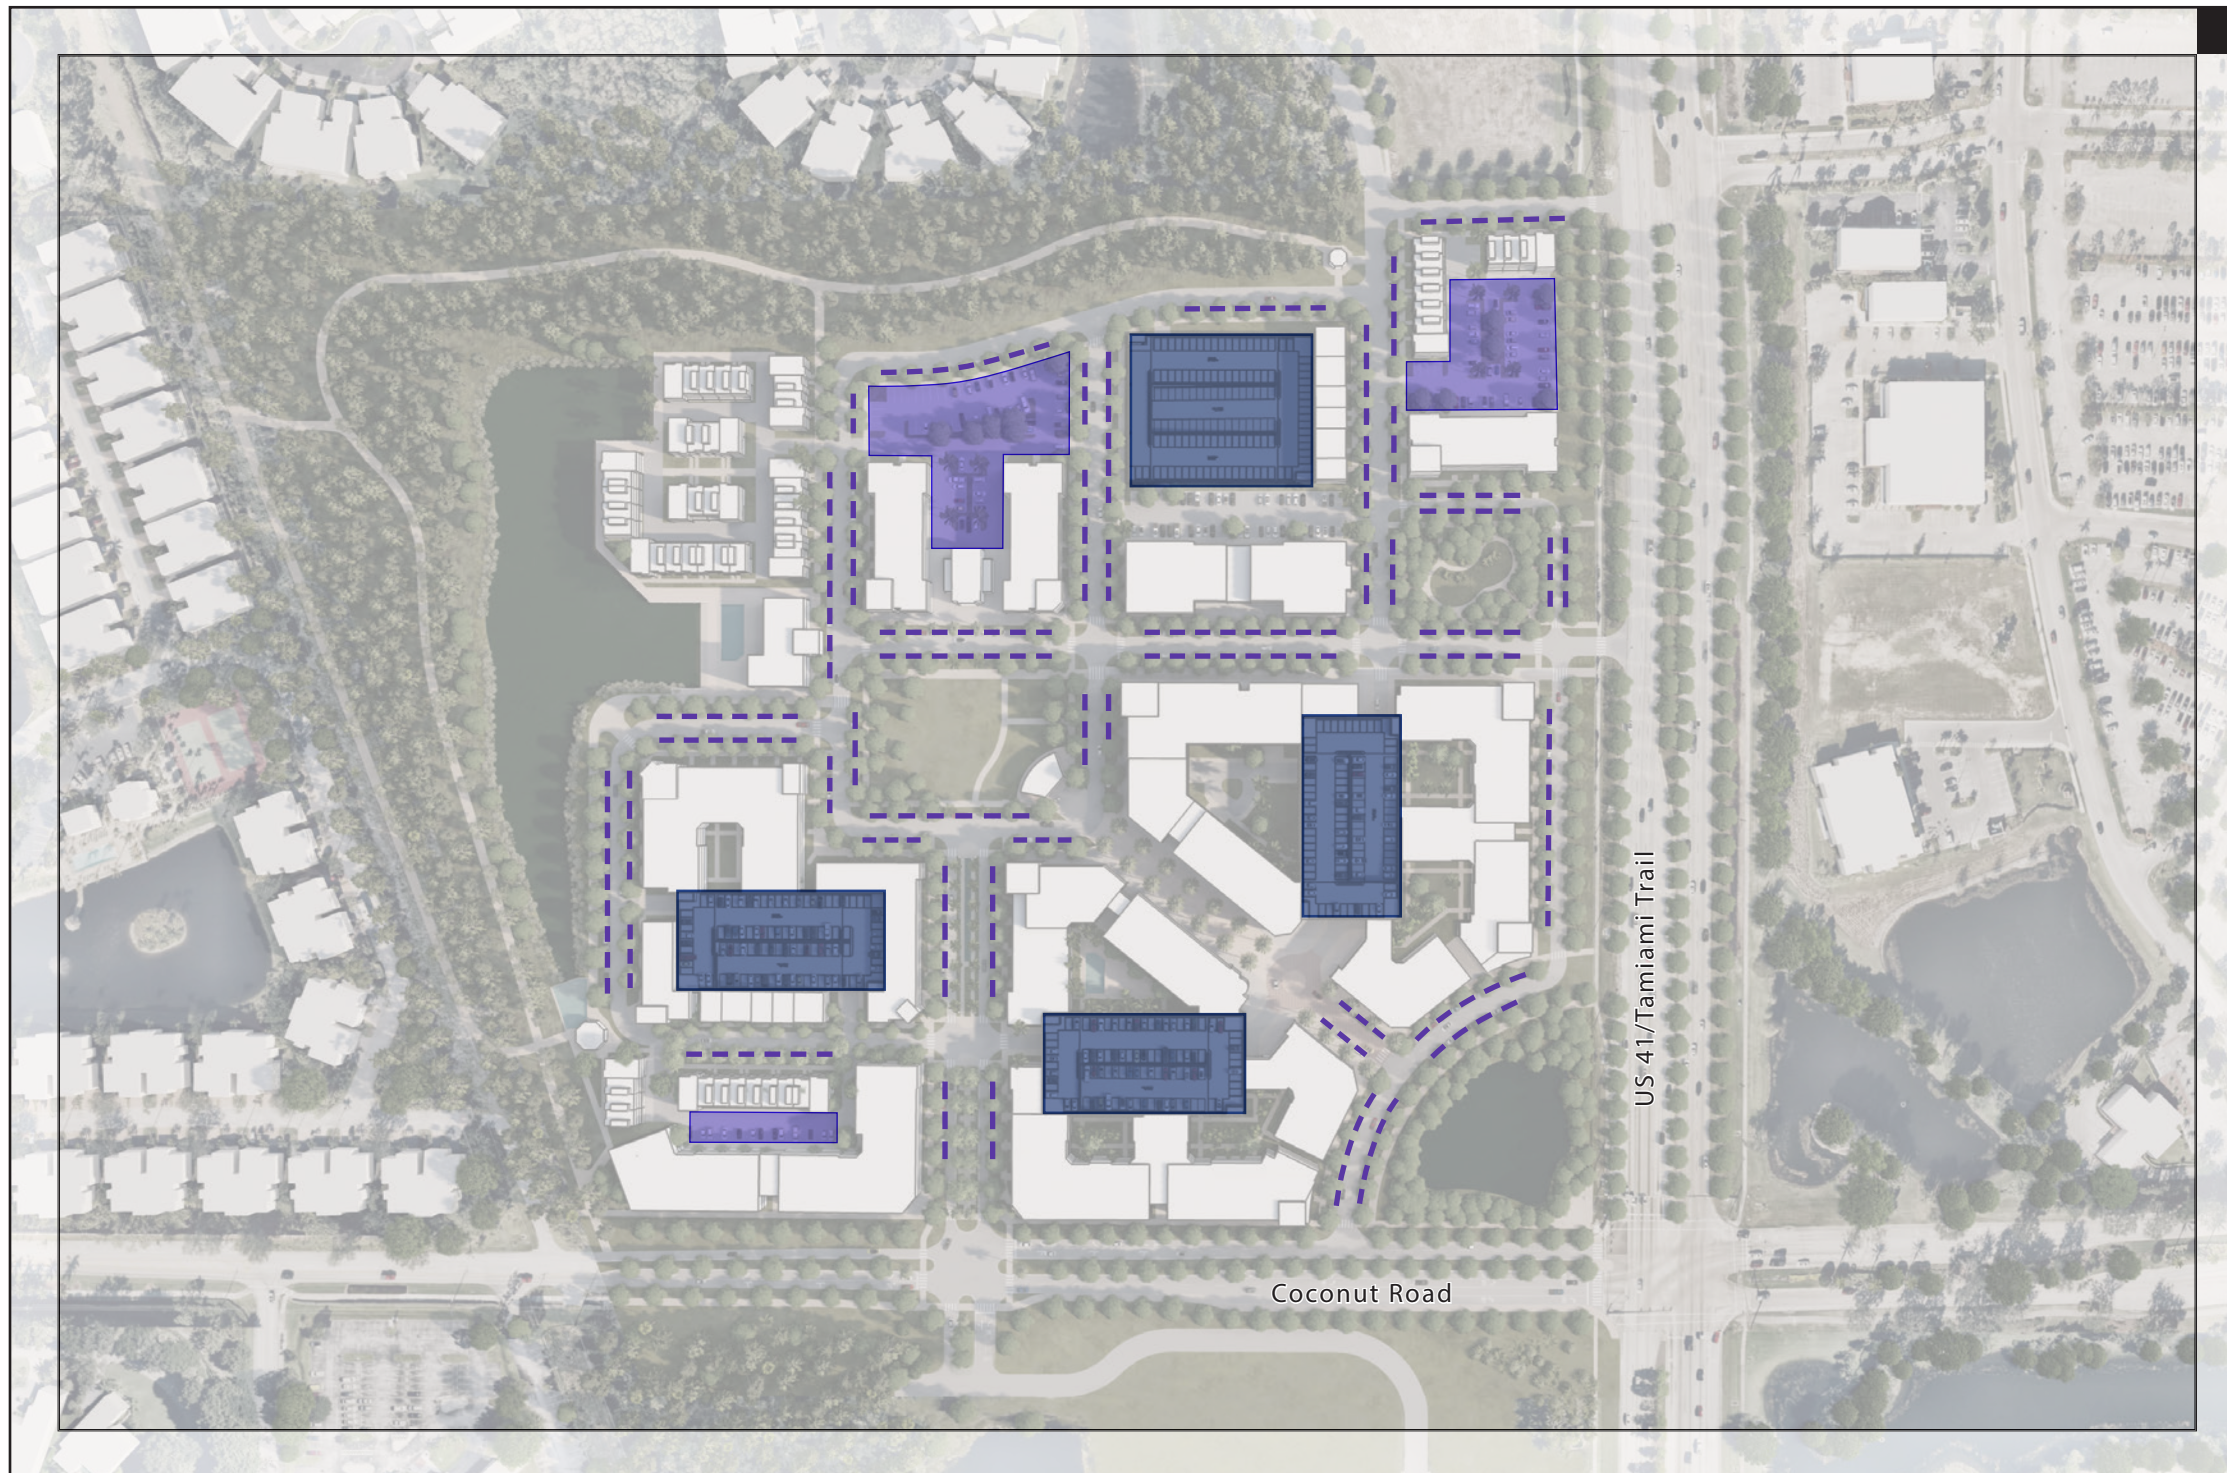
Plan of Active Ground Floor Uses + Special Building Sites
